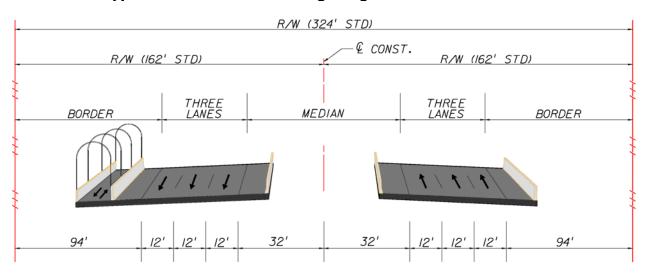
Typical St. Johns River Crossing Bridge Cross Section with Shared-Use Path
